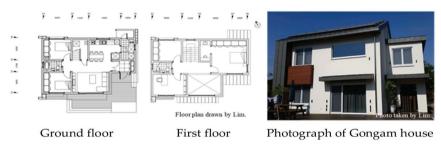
Floor plan and south facade of Gongam house (Lim et al., 2021, 6410
